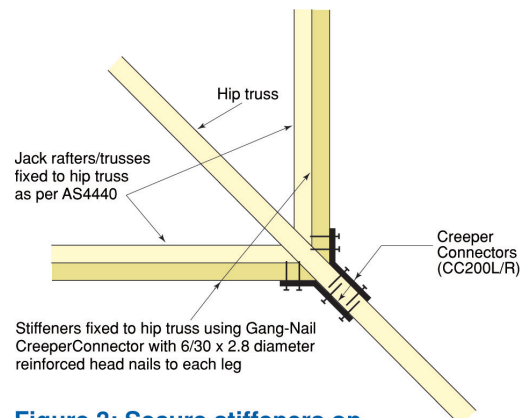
Secure stiffeners on jacks to hip truss with Creeper Connector
